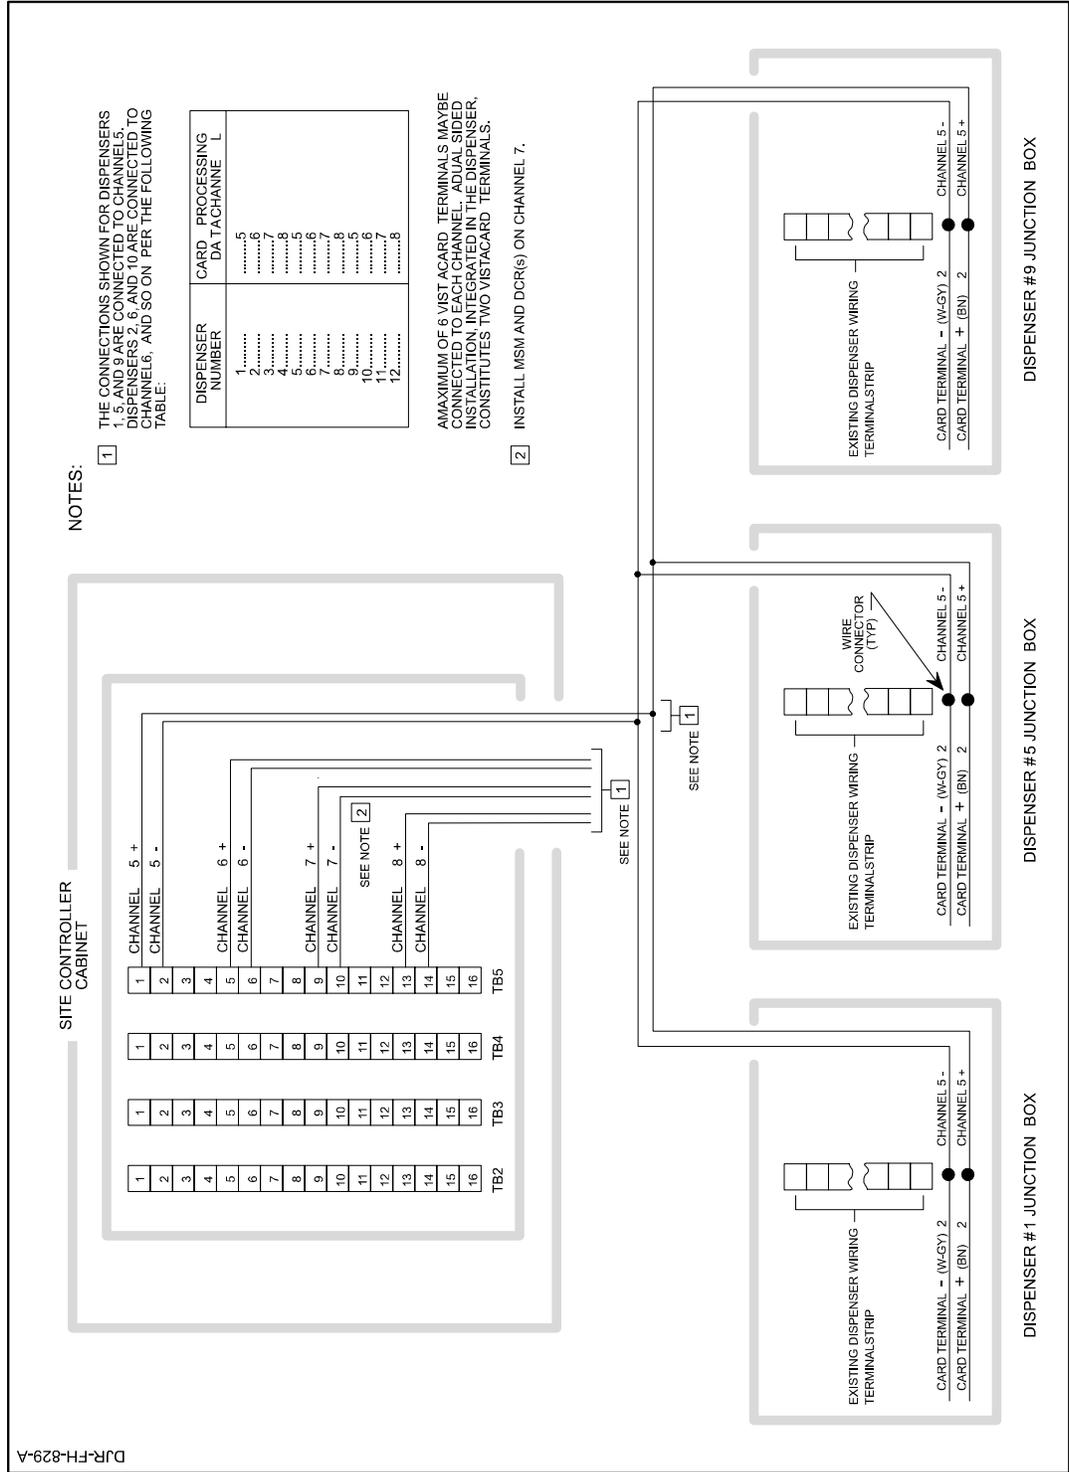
Indoor Wiring For Vistacard Retrofit (WP/386 System)
